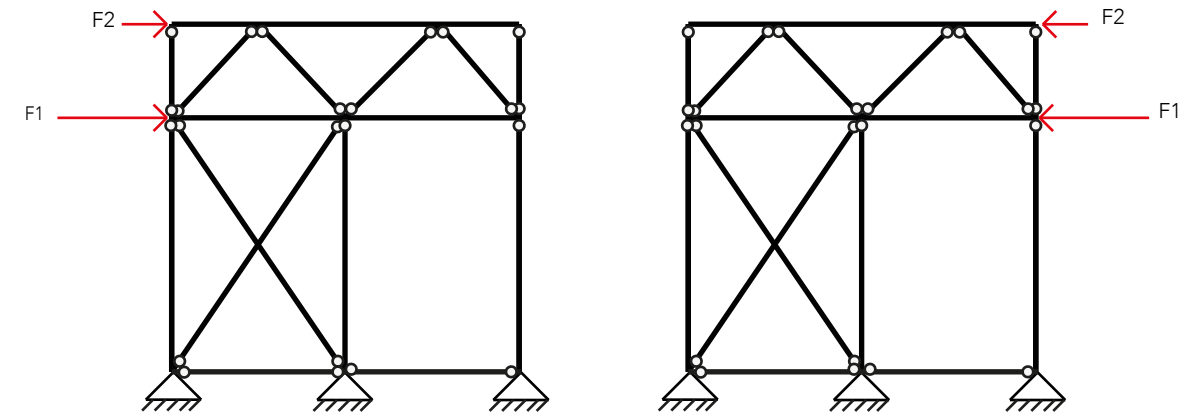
Loads on stabilization wall: wind from the left and wind from the right
